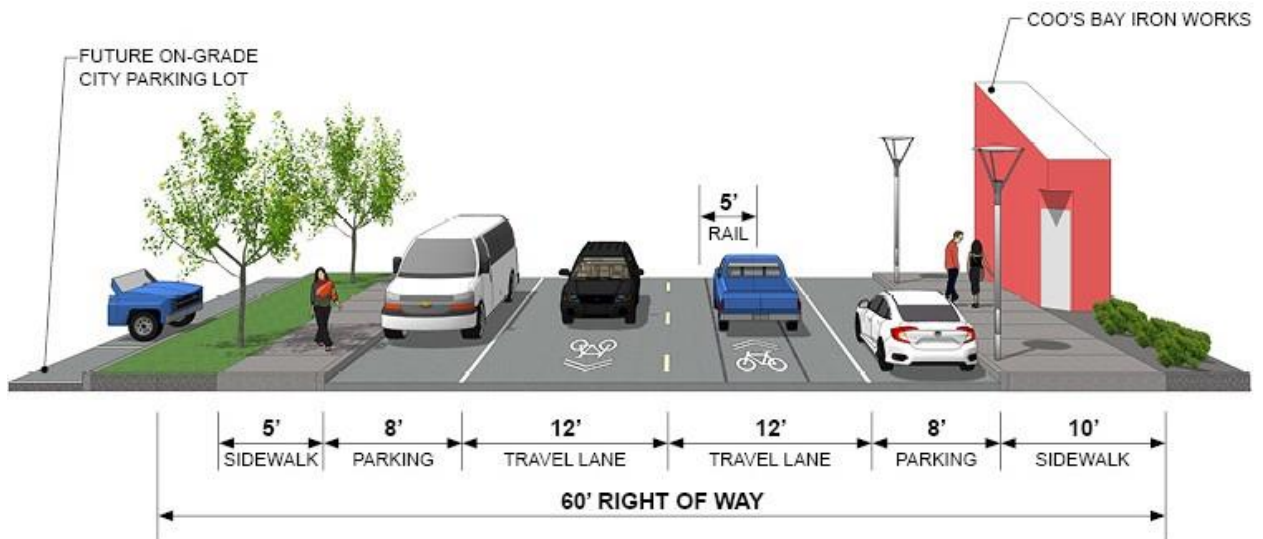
Alternative 2 - Proposed Section B (Date Street to Cedar Avenue)
